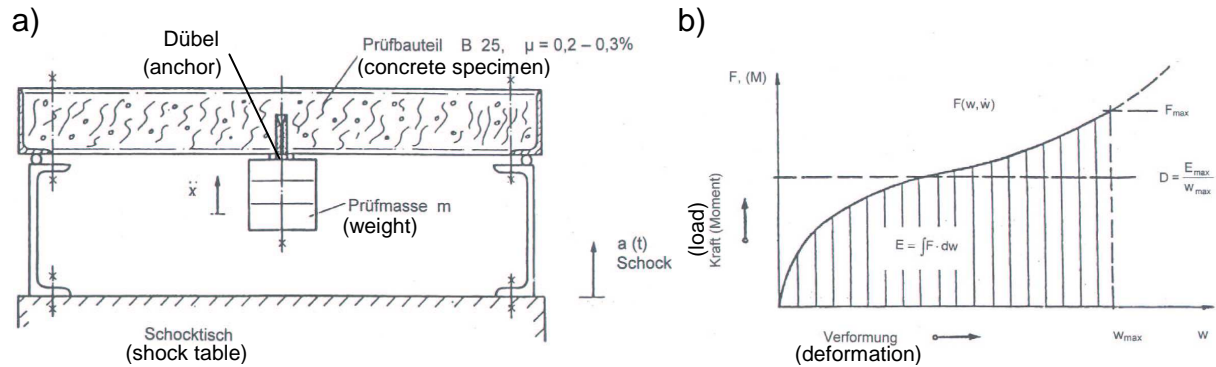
Test arrangement for anchor shock testing according to *BM Bau (1981)*:
